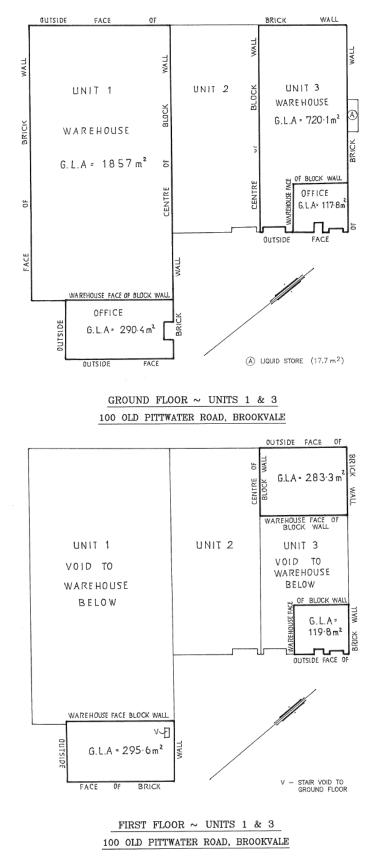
Unit 1 Floor Plans Source: Hill and Blume
